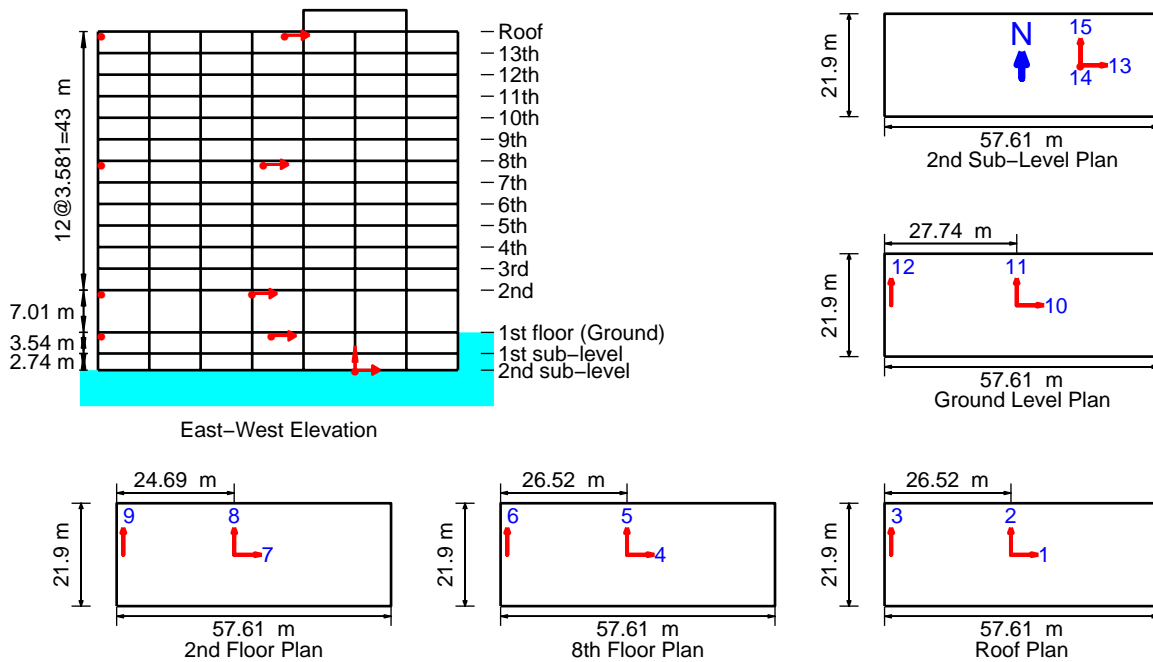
13-Story Commercial Building in Sherman Oaks.
